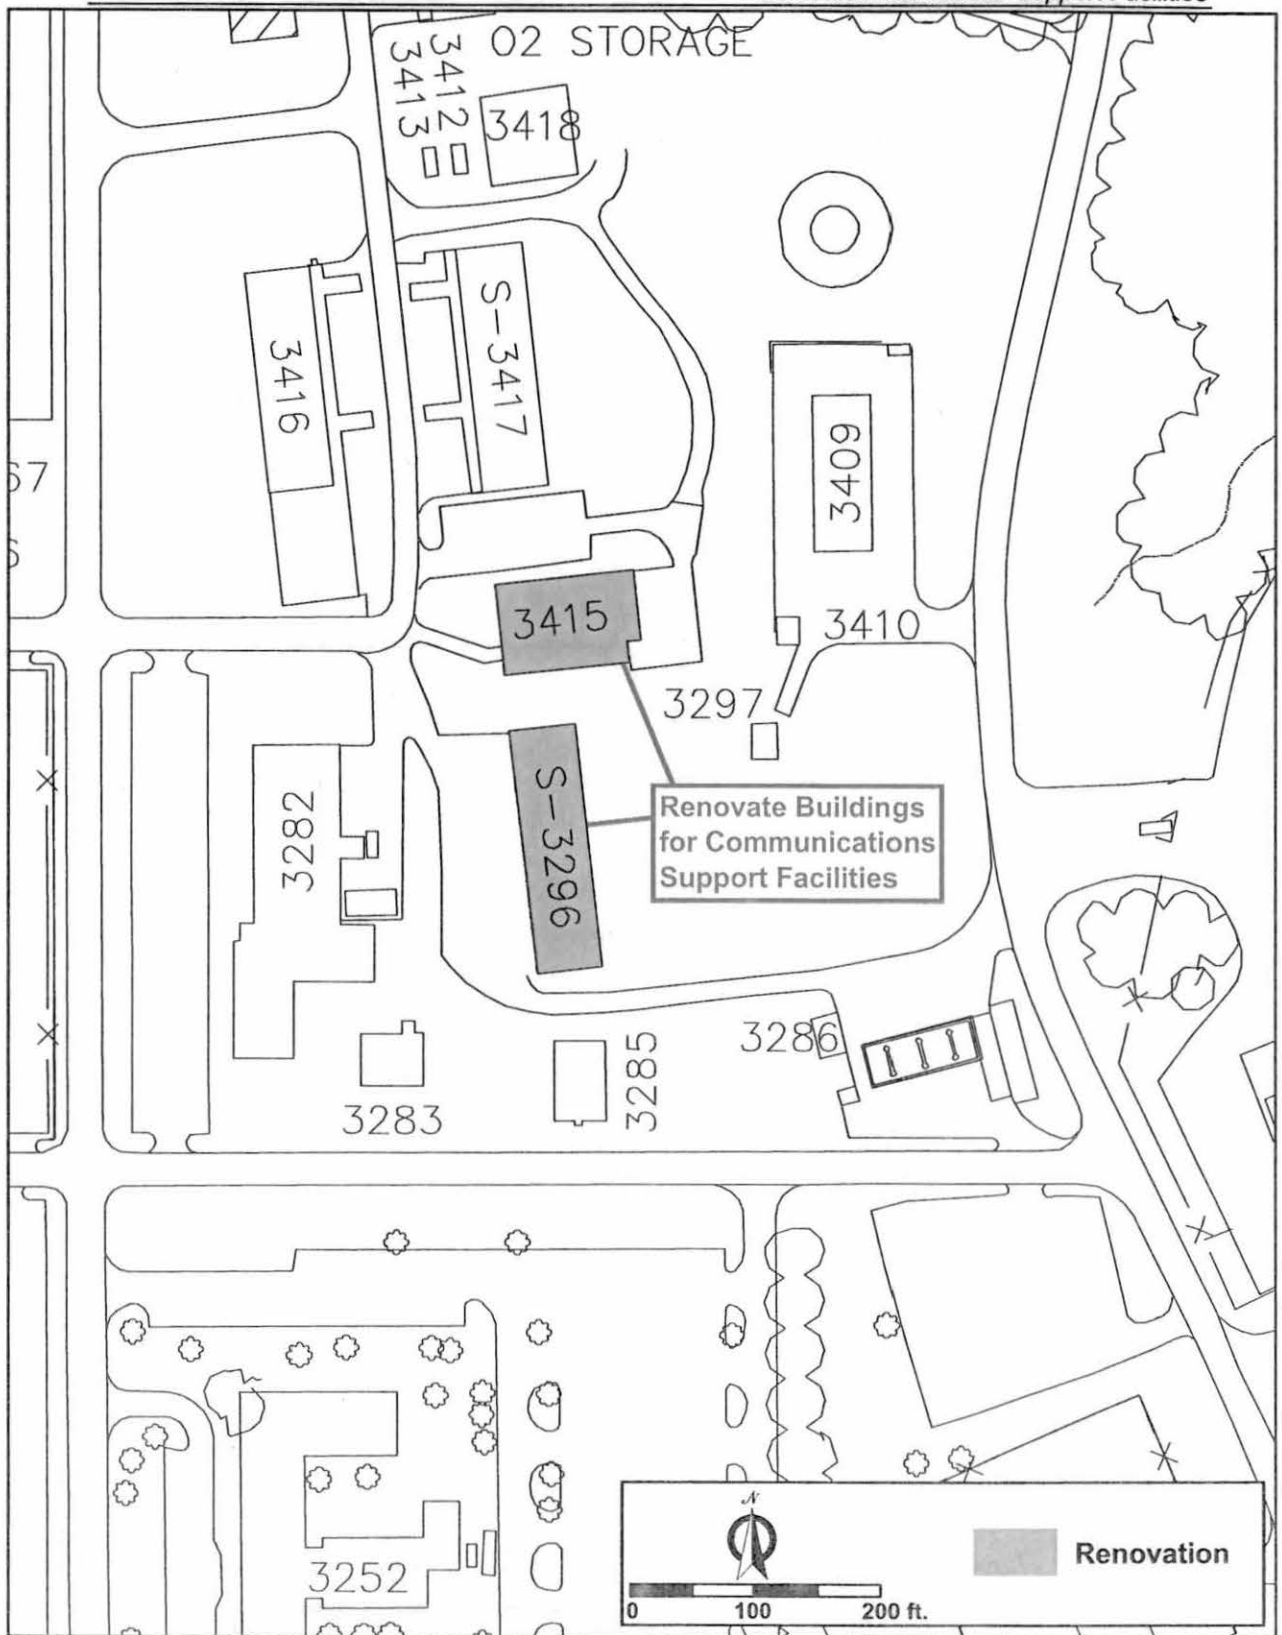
Locations of Proposed Modifications to Buildings 3296 and 3415
